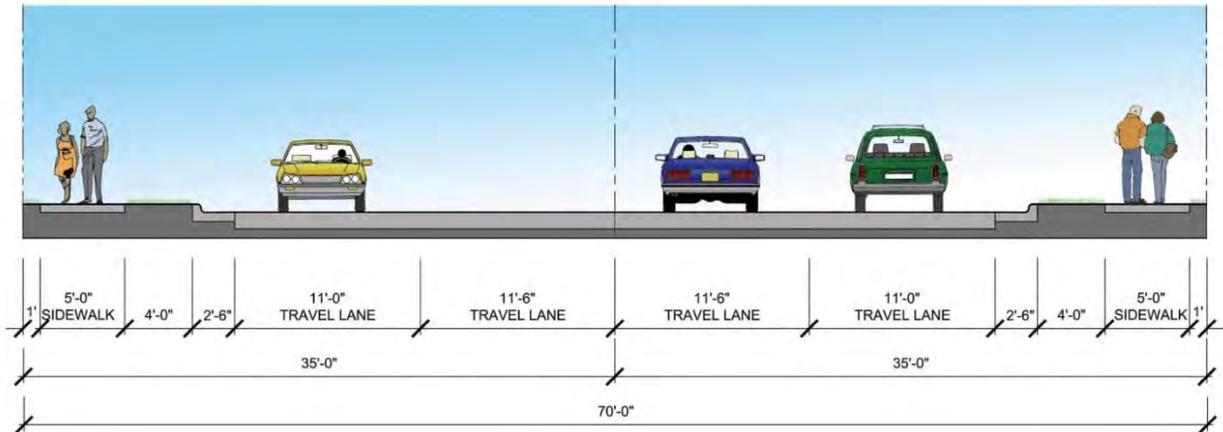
Four Lane Thoroughfare Cross-section
